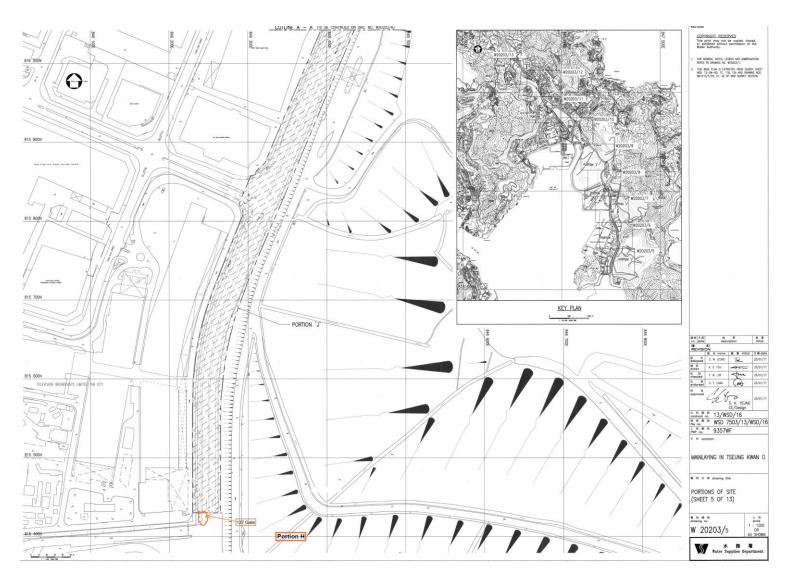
Location Plan for Portion H- TKO Area 137 Entrance (137 Gate)
